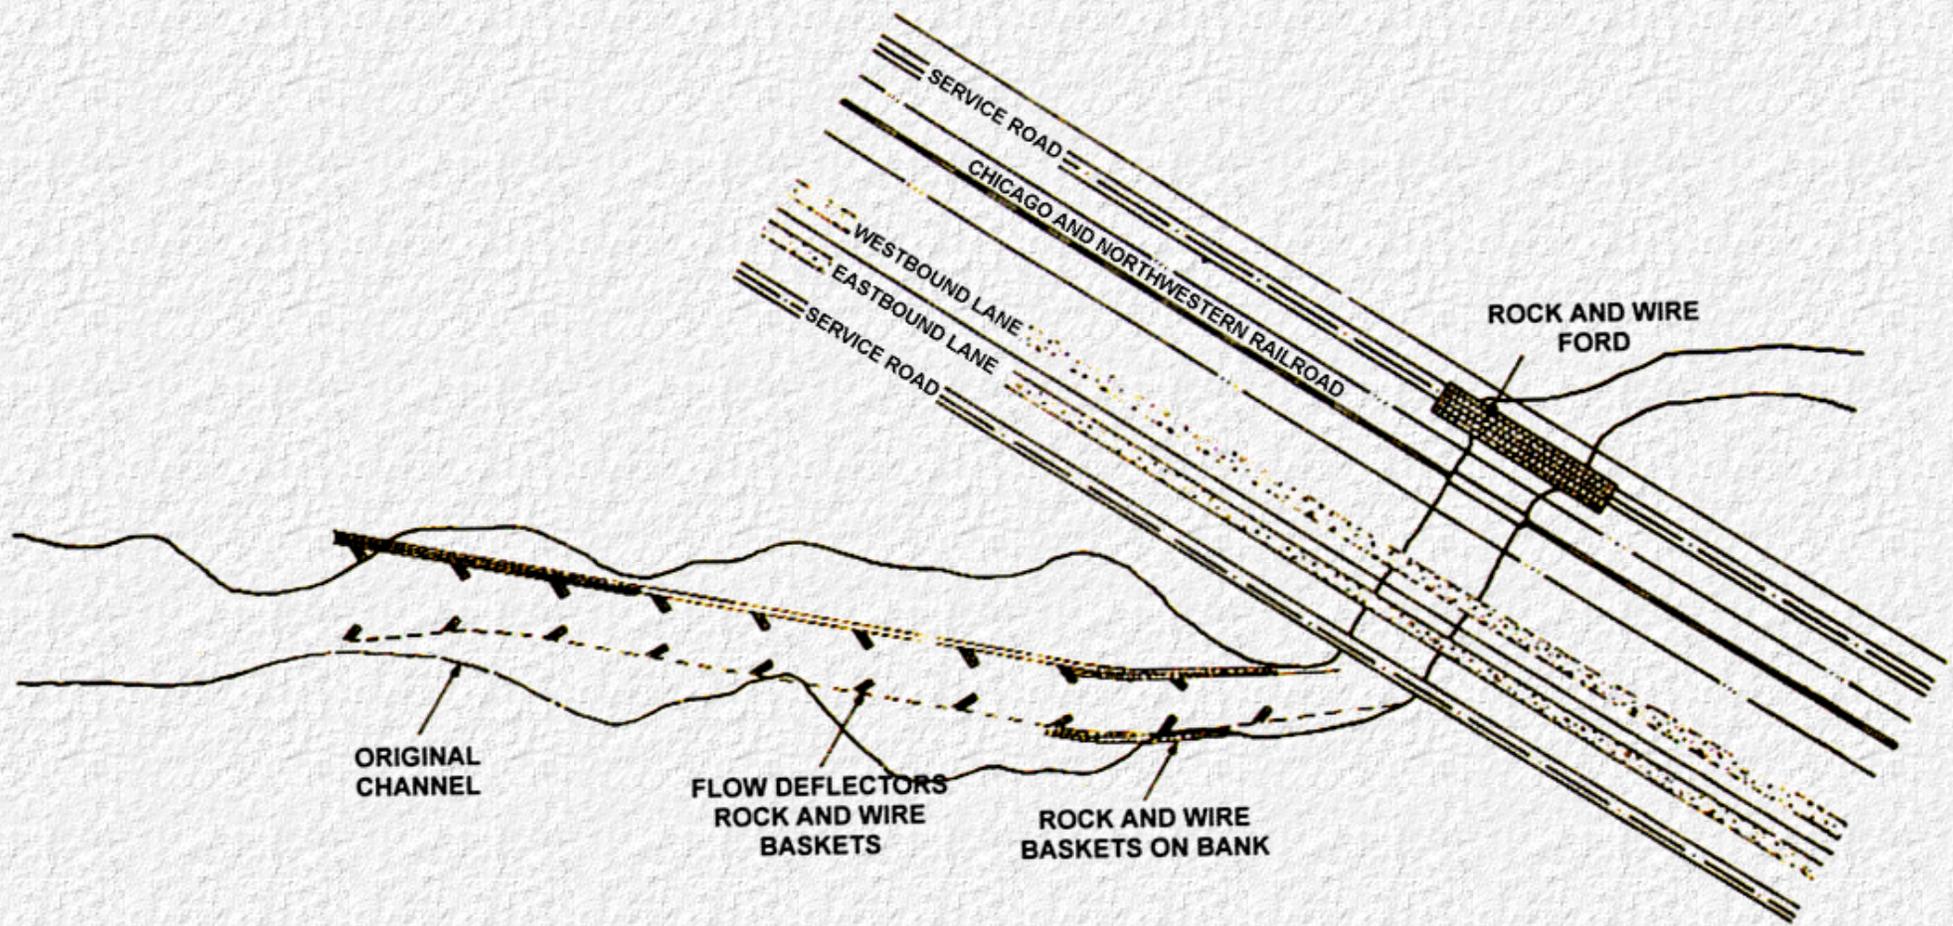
Deflector Arrangement and Alignment Problem on I-90 Bridge across Big Elk Creek near Piedmont, North Dakota
